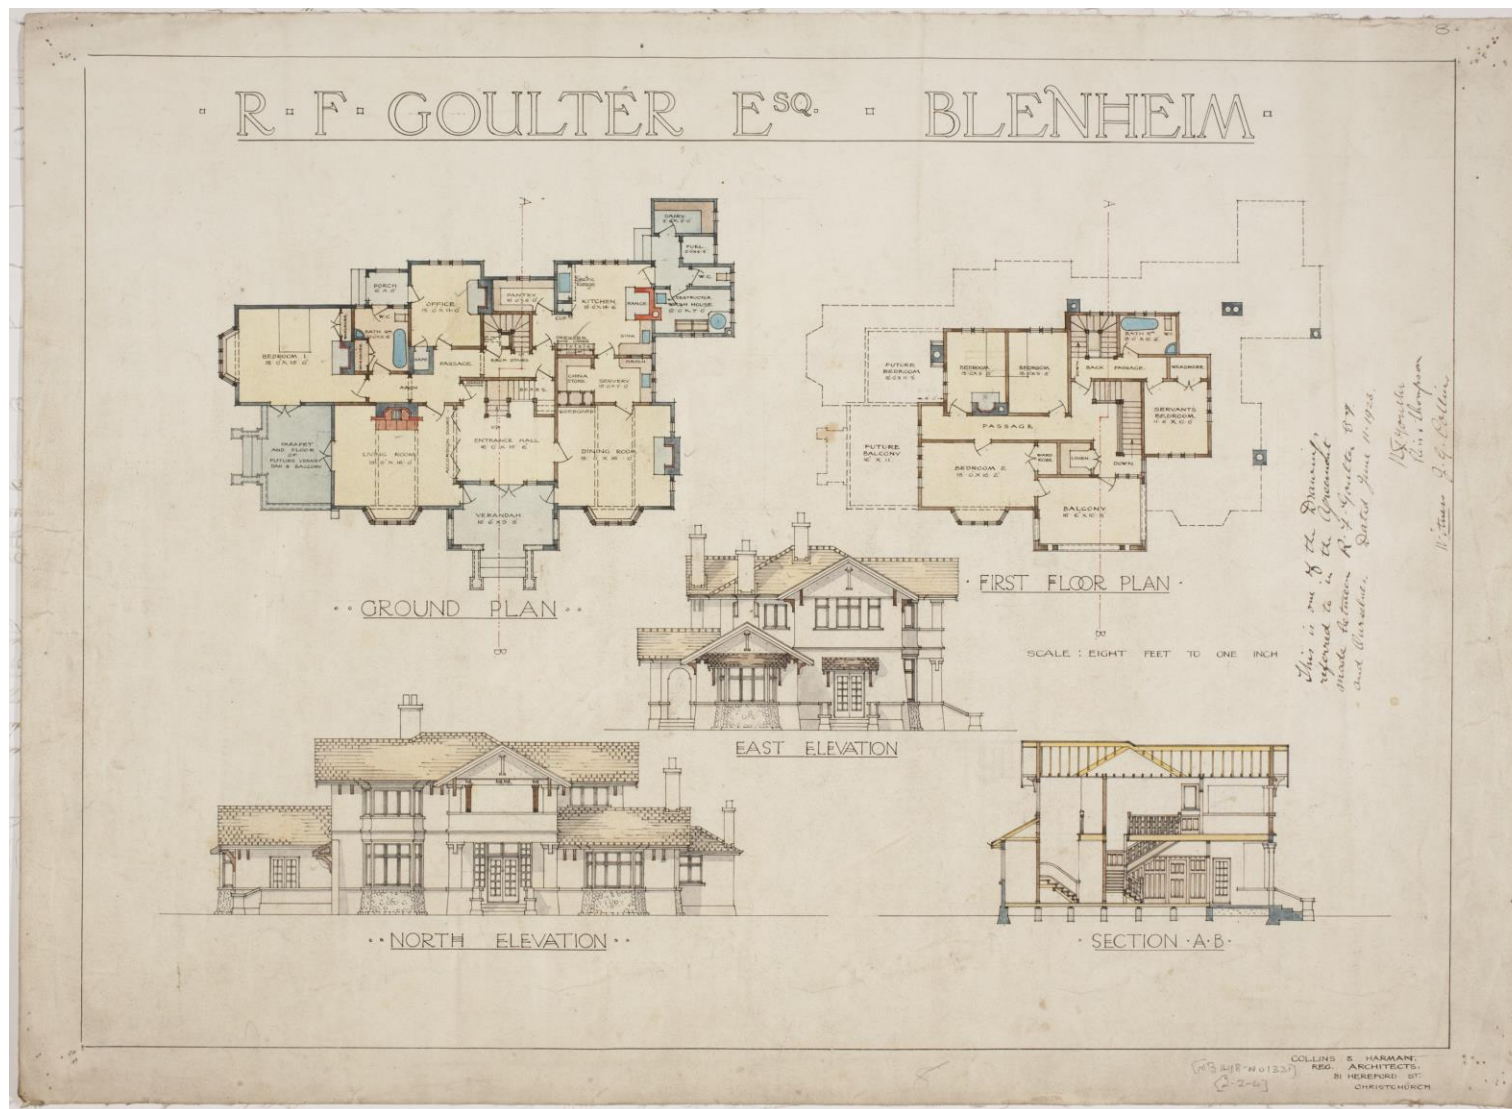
Collins and Harman, R. F. Goulter, Esq., Blenheim, plans, elevations and section (1923).
